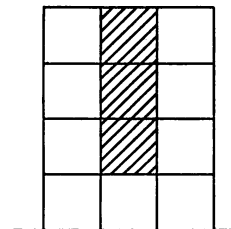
d Frame with three Panel Walls (Specimen-3)
